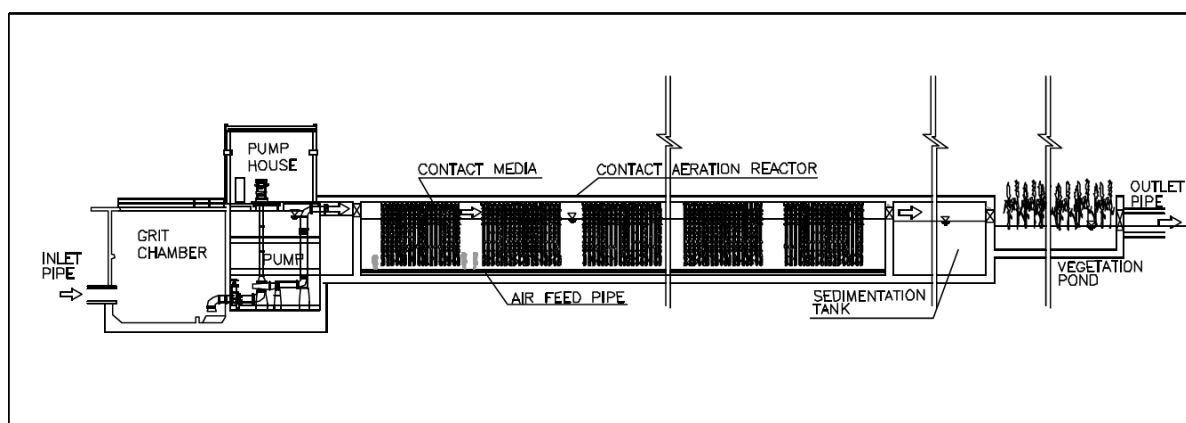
Typical Cross Section of Contact Aeration Plant
